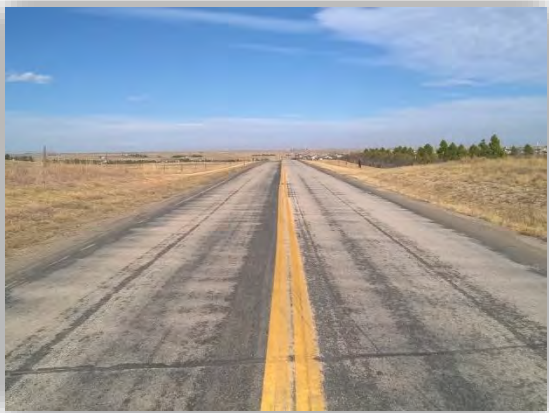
Whitney Road at US 30 (Looking southwest)
